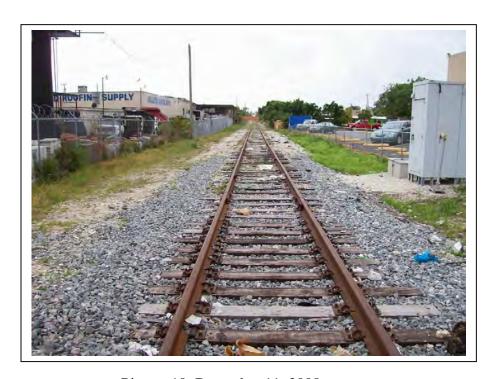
December 11, 2008 1 blodg away from Intersection @SW 4 ST looking South
